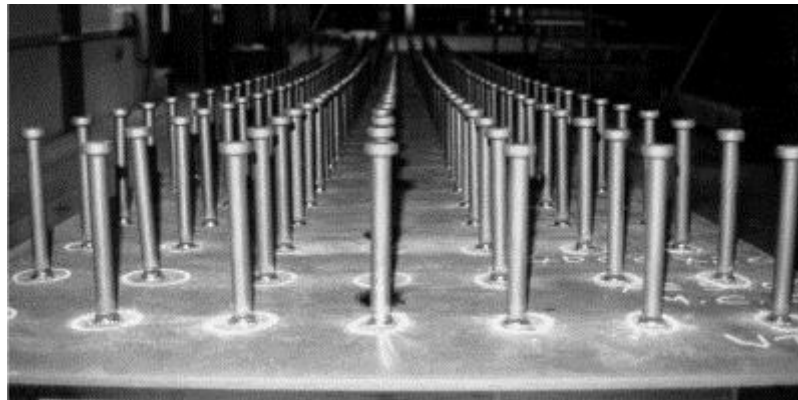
Shear studs welded to a steel plate. (McKinley et al, 2002 p. 1349)
